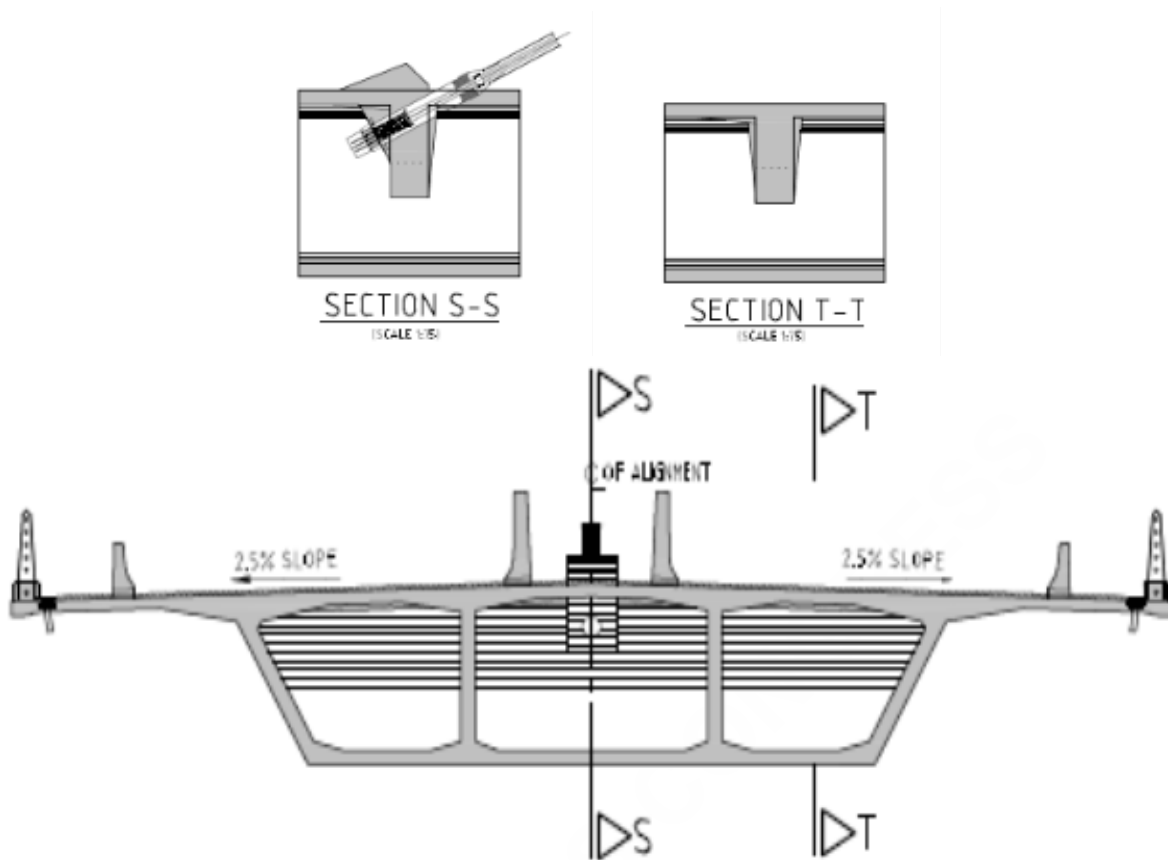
Typical Connection between central cable and wide multi cell deck
